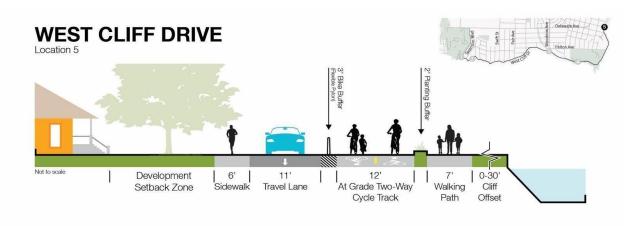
Alternative 2 Concept- Cross Section of Santa Cruz St at West Cliff Drive
